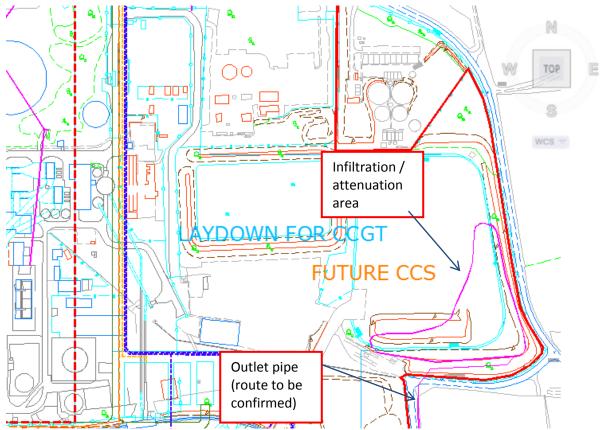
Sketch of proposed drainage solution for the Proposed CCGT Construction Laydown Area during construction
